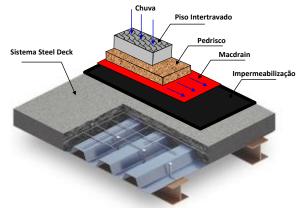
Application diagram of Drainage geocomposite on the concrete floor.
